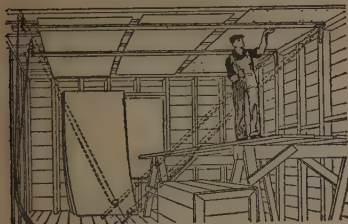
The wall board is raised to the ceiling on long, hinged boards.
